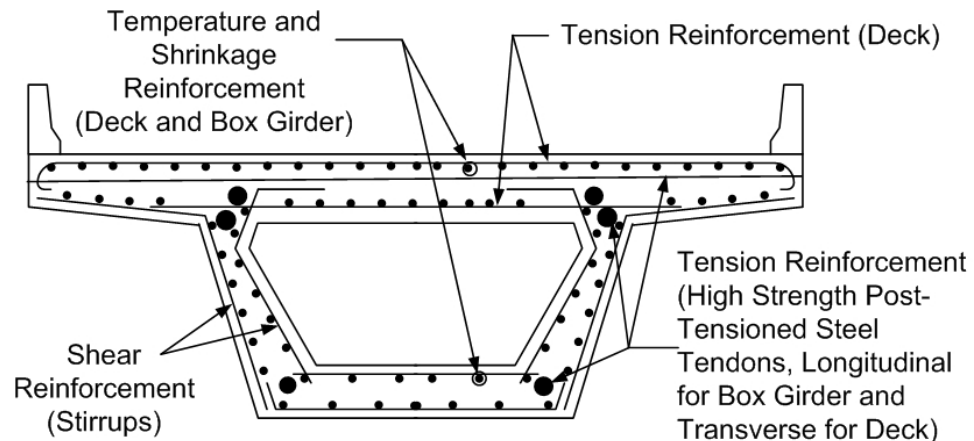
Primary and Secondary Reinforcement in a Concrete Box Girder
